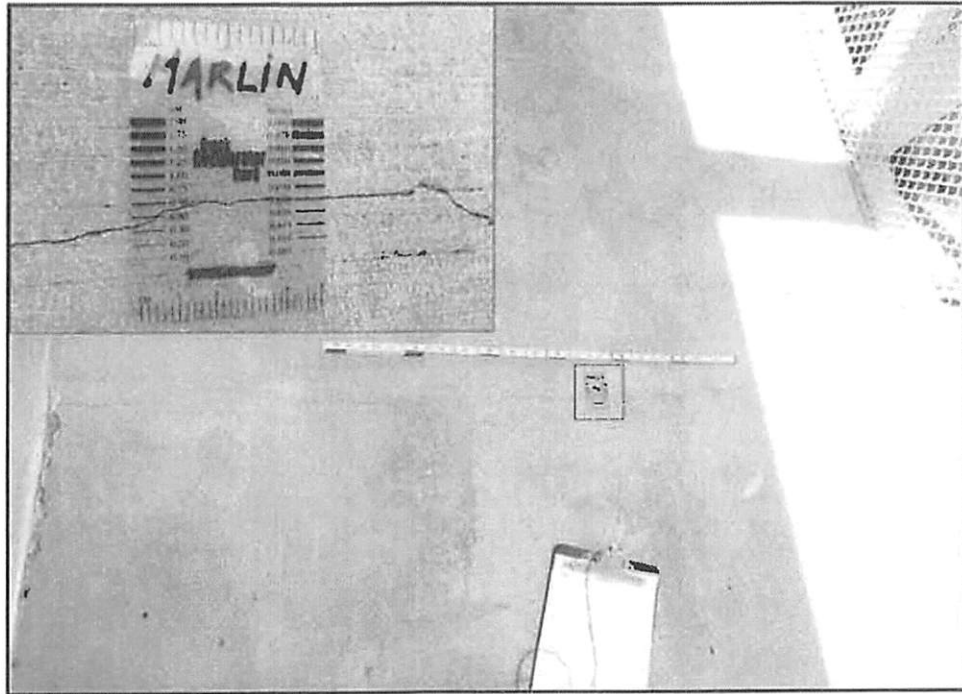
Typical full width transverse crack up to 1/32in. W on the deck top.
